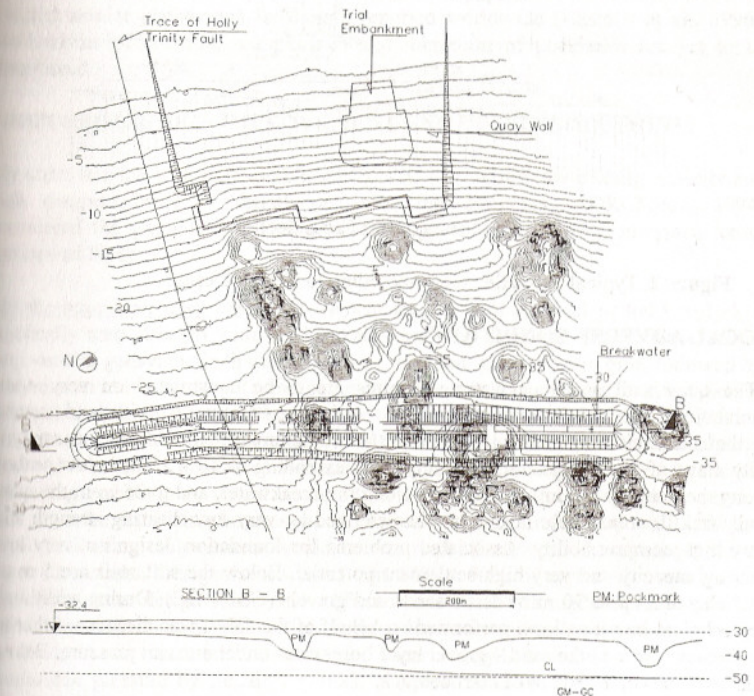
Plan View of Quay Wall and Breakwater Structures, Cross Section along Center line of Breakwater
